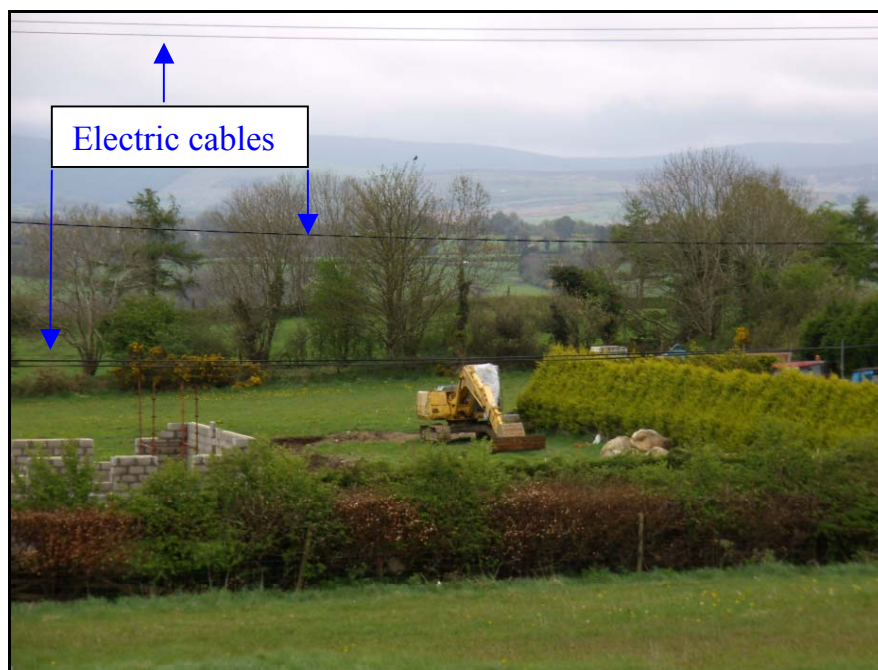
View from top of hill - airfield and drop zone are behind the camera position
